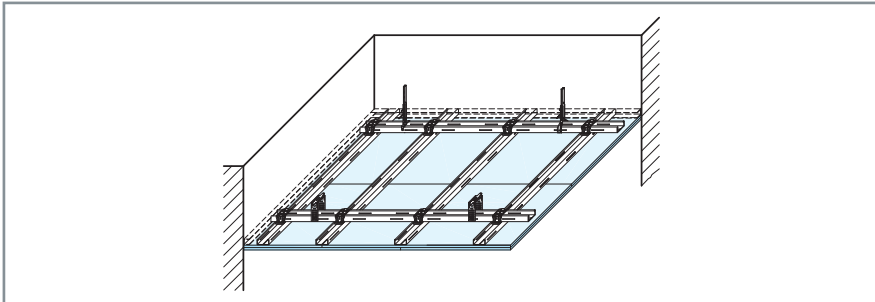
Board ceiling with wooden substructure with two substructure levels
